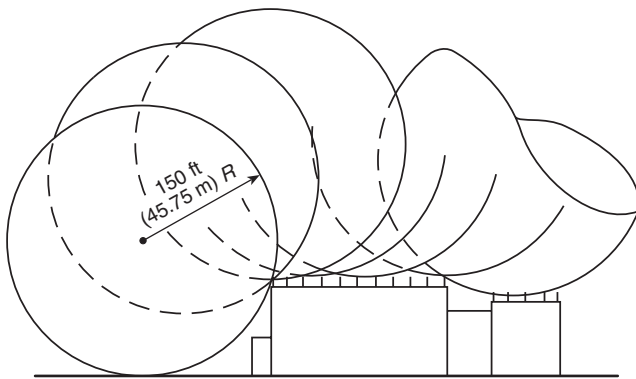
(b) Lower roof protection provided by pitched roof buildings 50 ft (15.24 m) or less in height.
